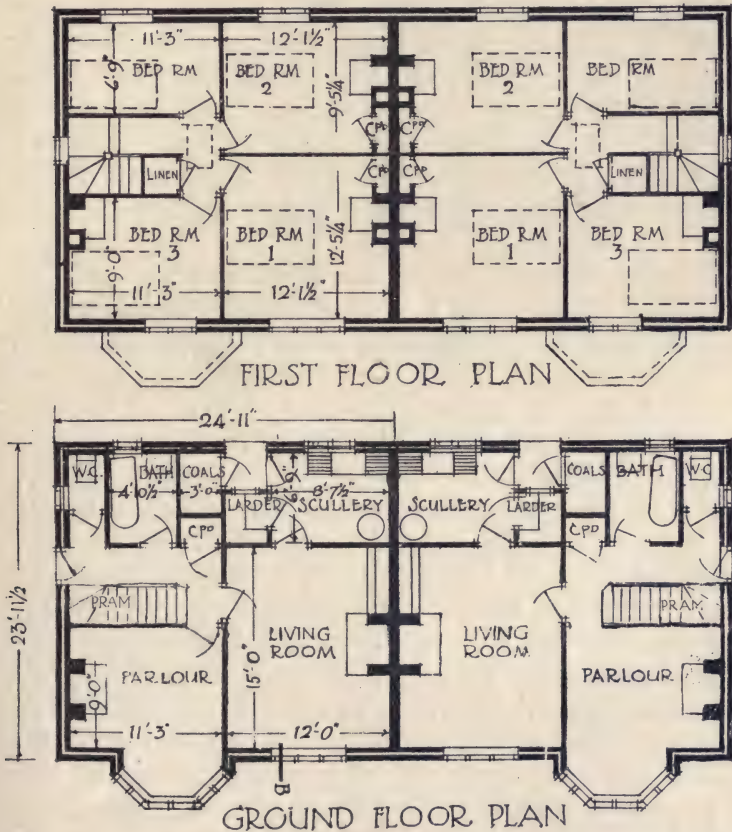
Plan of houses with two living-rooms and four bedrooms. Frontage faces south.
